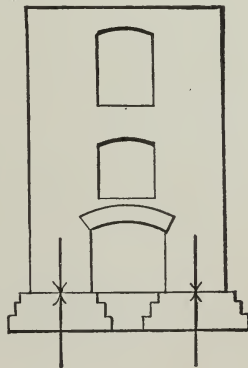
Correct Method. Separate Piers and Dwarf Walls.
